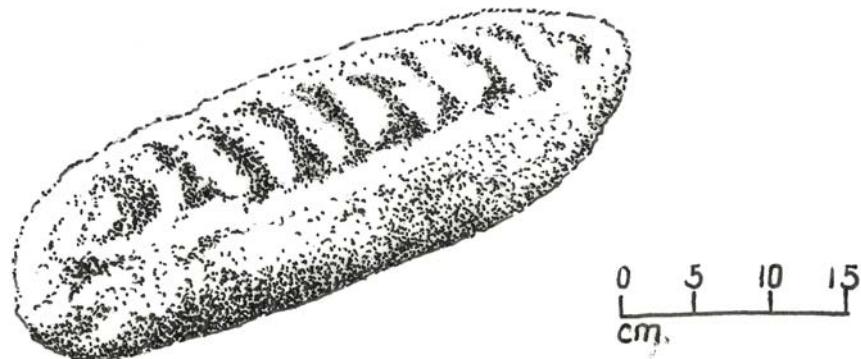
Sun-dried brick, circa 8000B.C. (Drawn by author, adapted from *Masonry Design and Detailing*, p. 4)
